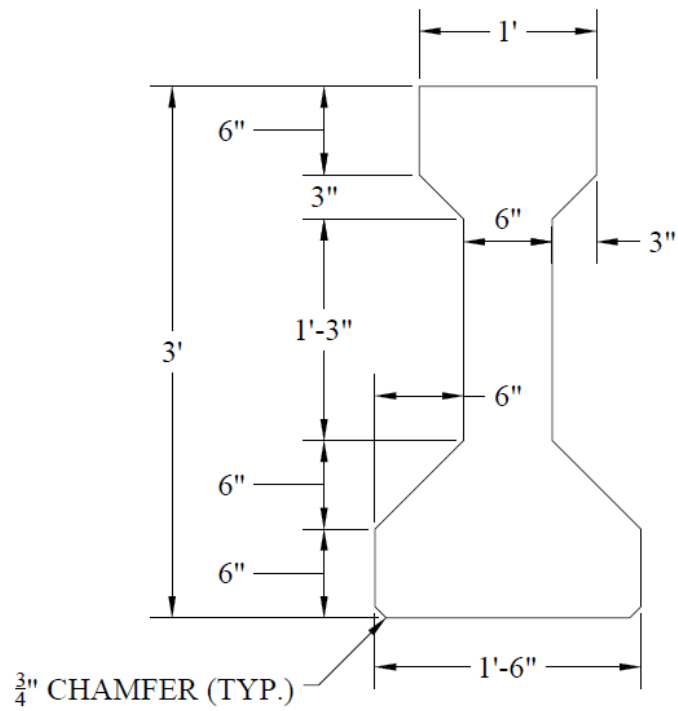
AASHTO Type II Prestressed Girder (LEE-1)
